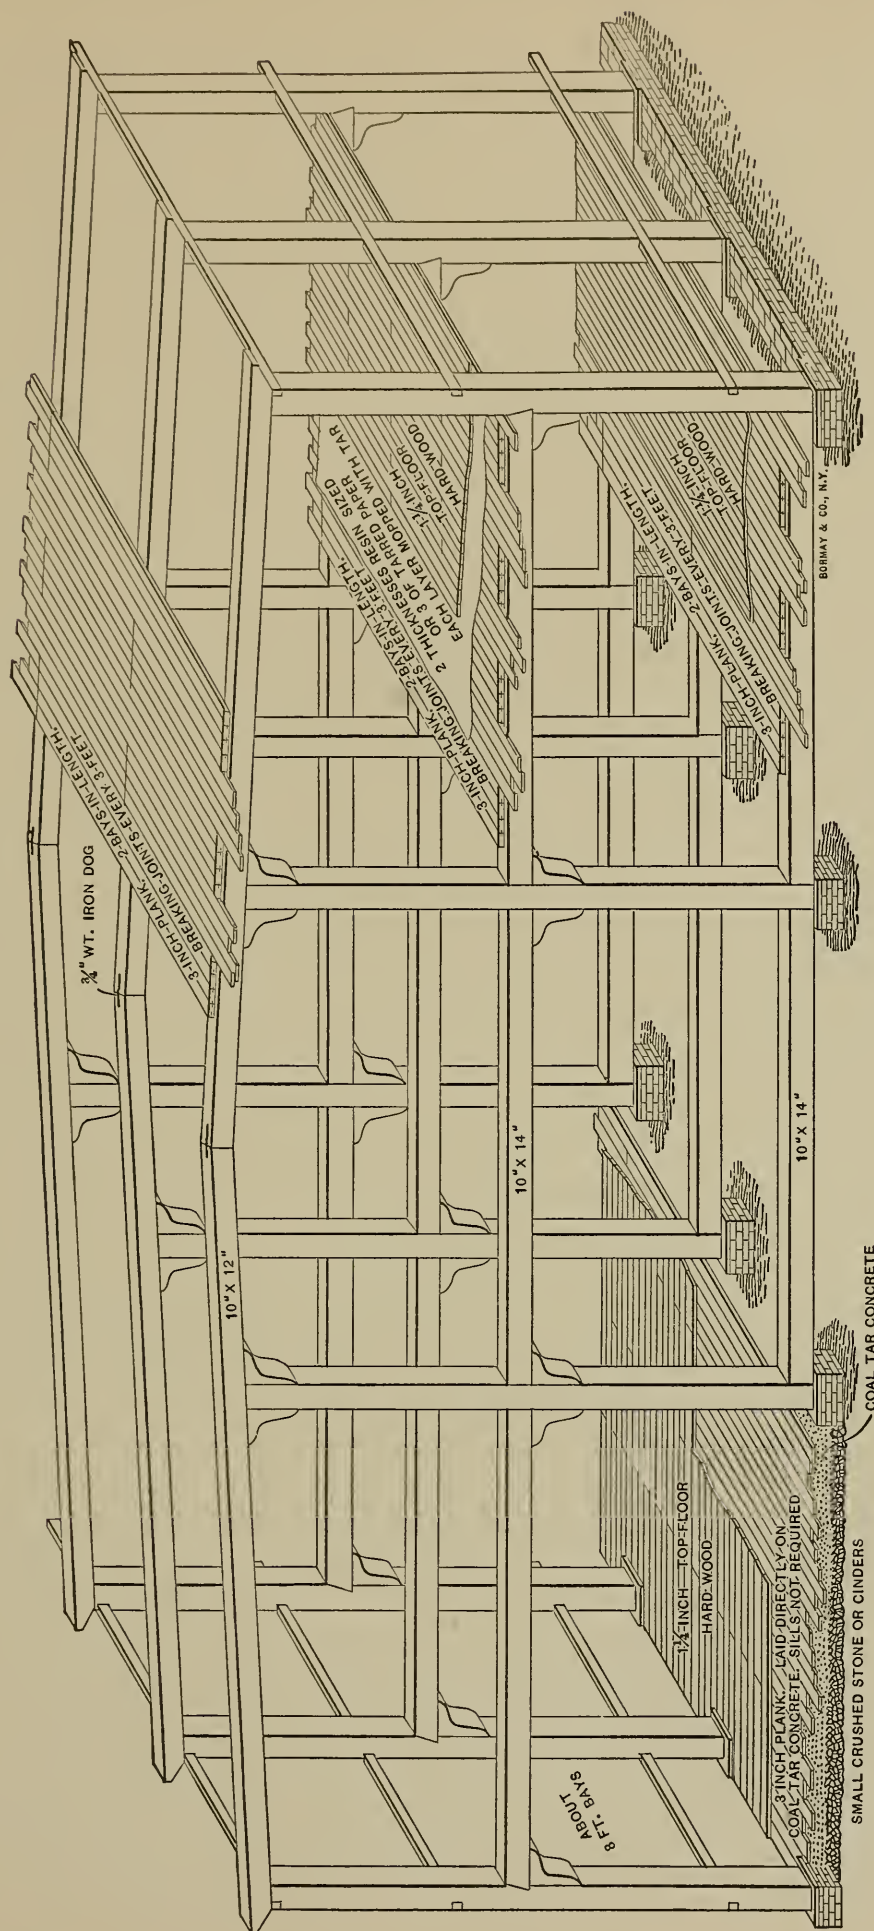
Factory Building of Slow-Burning Construction, of Wood only.
